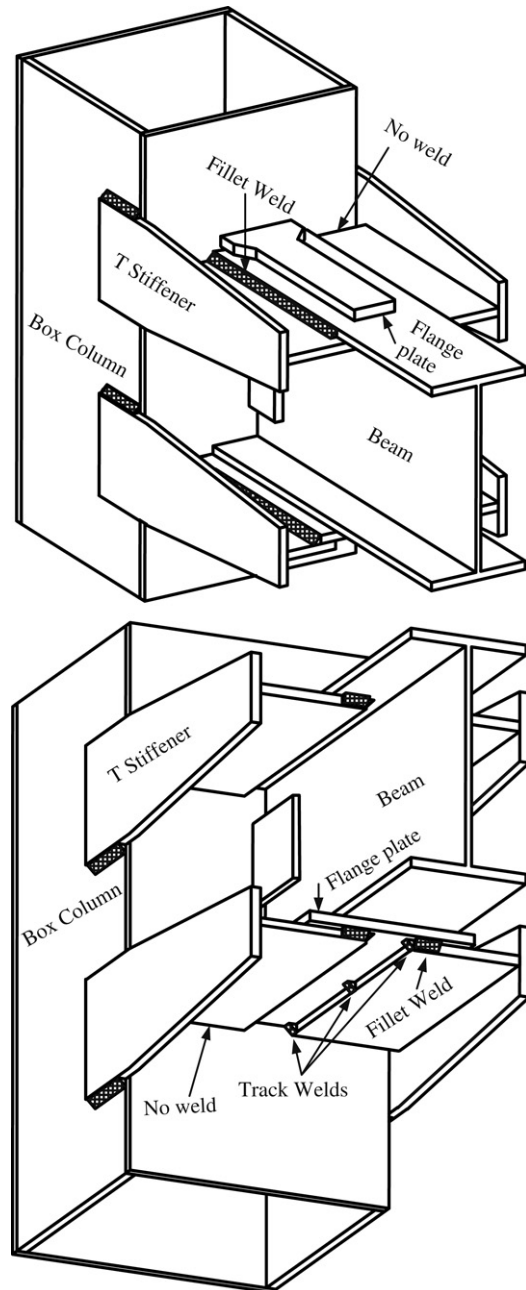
Proposed joining configuration of the T-stiffener to the flange plate connection, top and bottom view.
